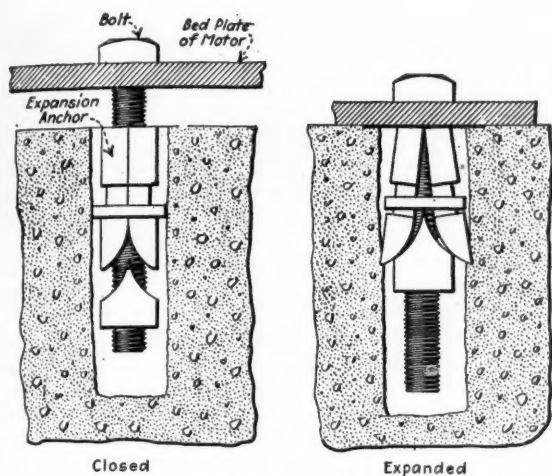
SINGLE-SPREAD ANCHOR BOLT IN POSITION
